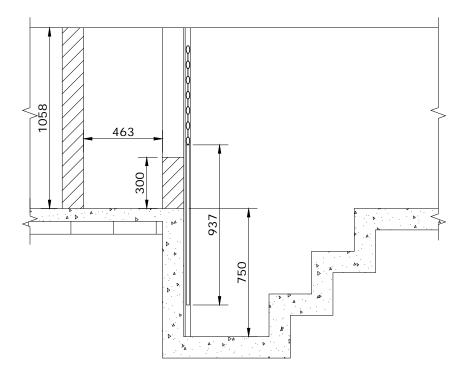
Section B-B (Section along Overflow Gate of Flow Diversion Structure)
